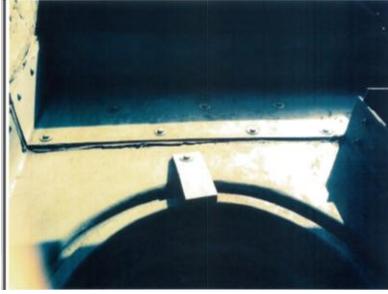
Looking south towards curb inlet after BMP has been clean.
